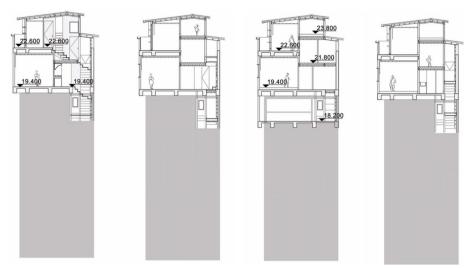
Cross-sections of the Water Tower Home transformation design (Source: Wutopia Lab)
